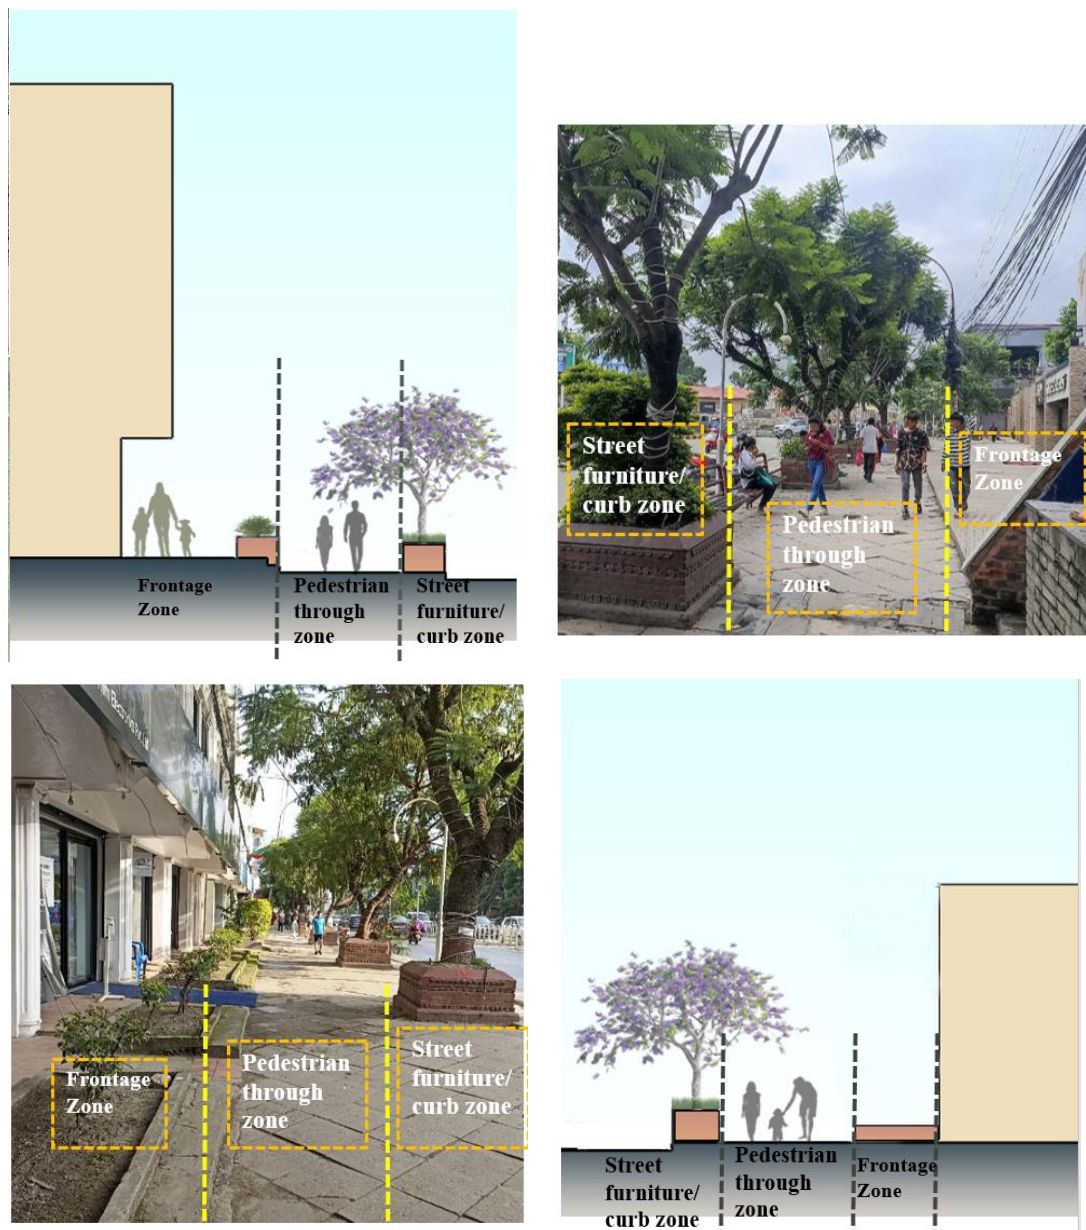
East facing and West facing Sidewalk Picture Credit: Author
